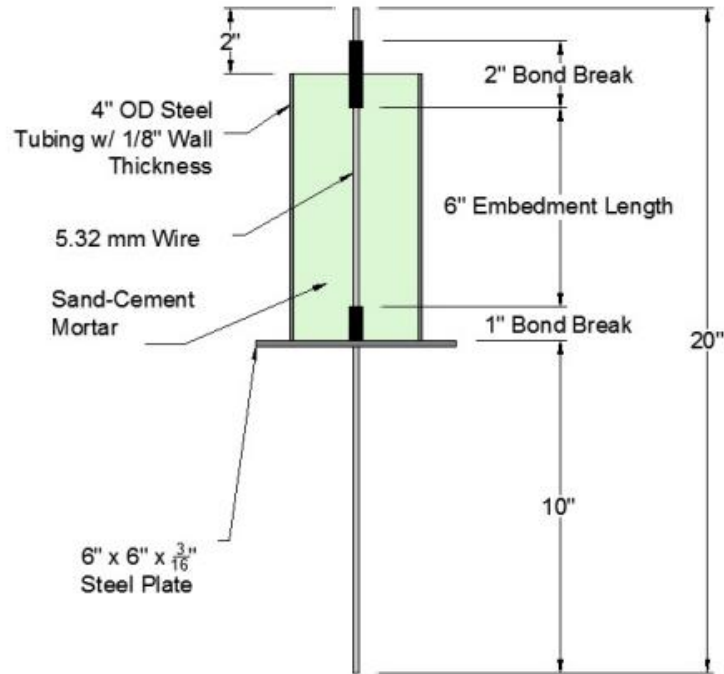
Dimensions of Wire Pullout Test Specimen (Arnold, 2013).
